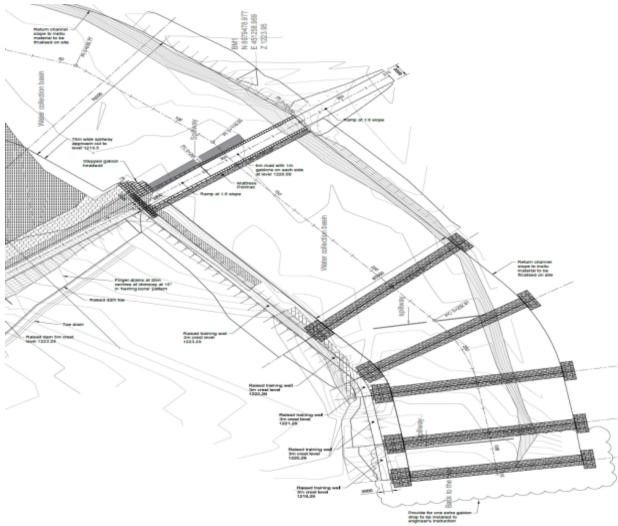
Plan View - Layout of new gabion bolster drop structures.
